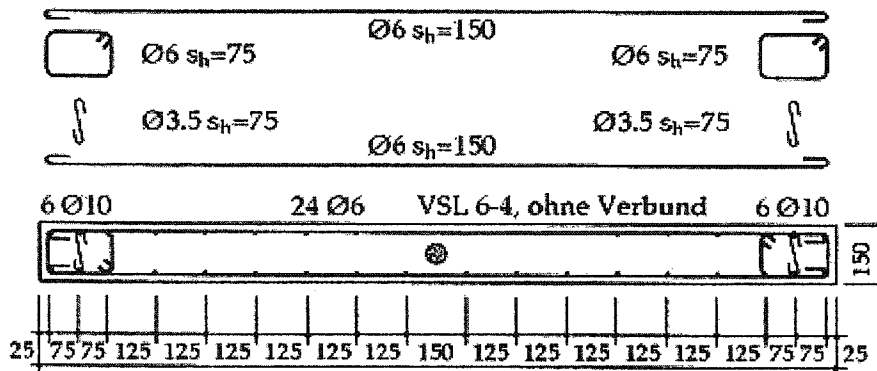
Reinforcement details of WSH2 (after Dazio et al. 1999)
